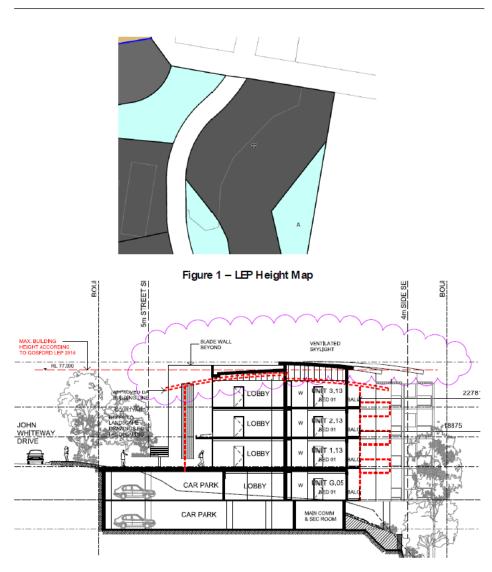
Section 2 of the submitted plans showing height of lowered part of building
